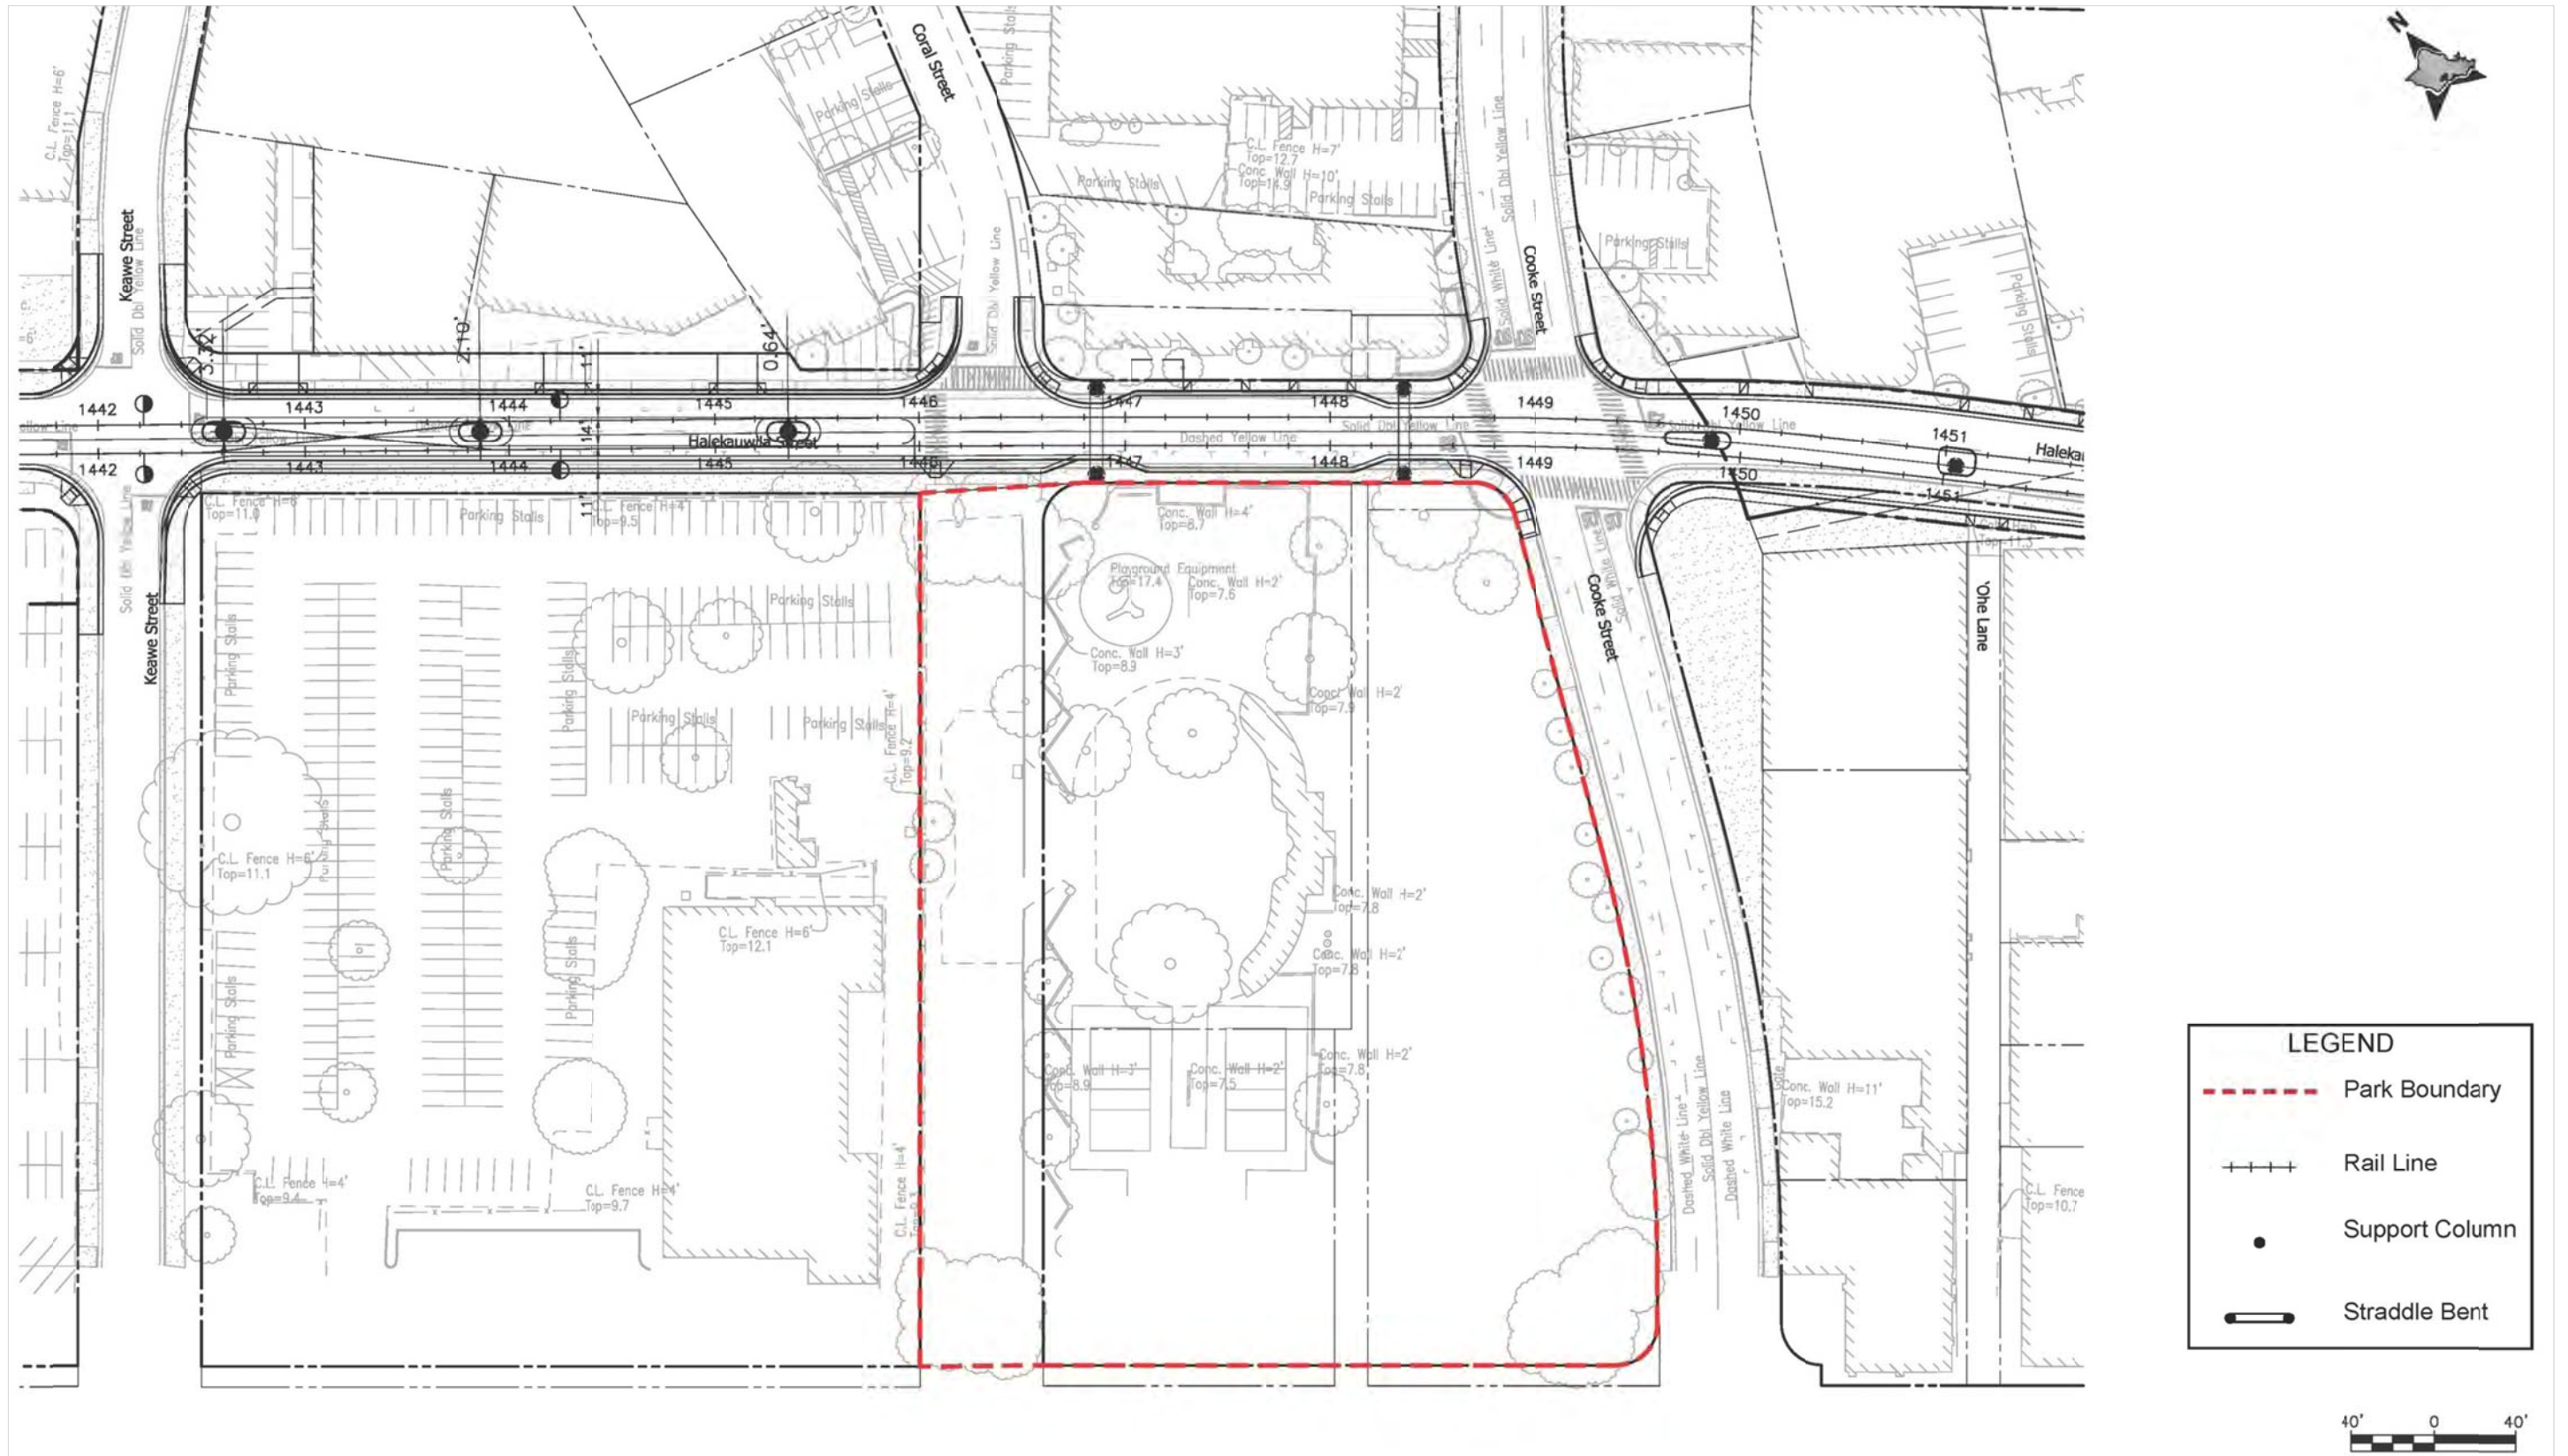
Detail of Honolulu Rail Transit Project in Relation to Mother Waldron Neighborhood Park
